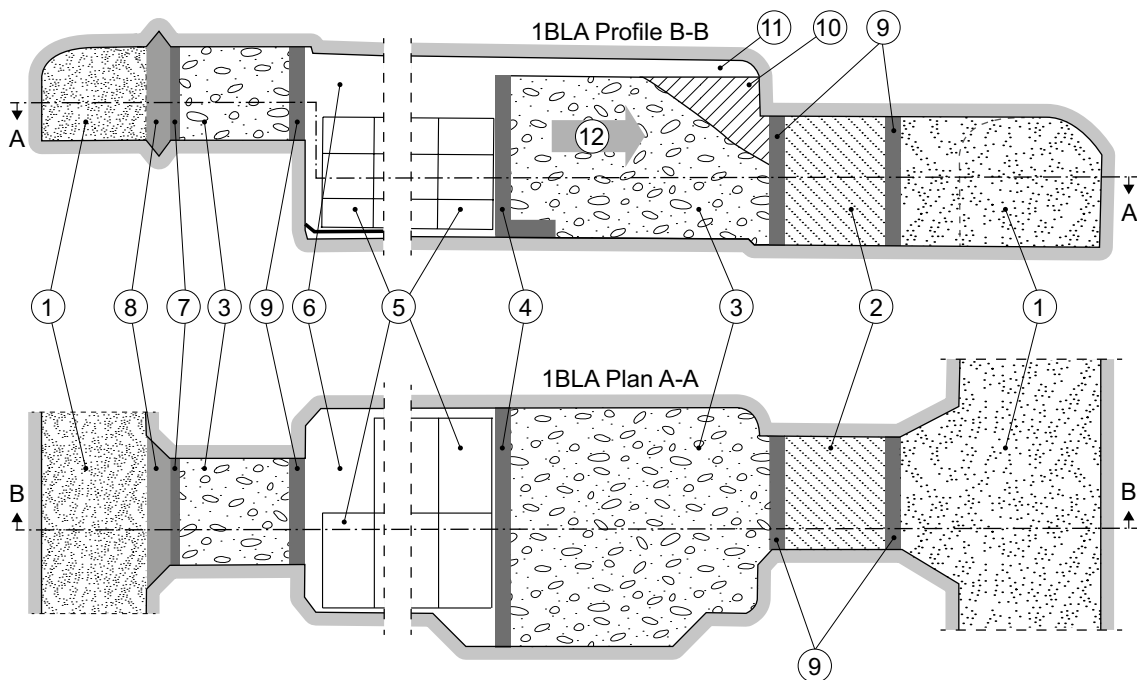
Schematic profile and plan of 1BLA after closure. Key to numbering: 1) Bentonite 2) Transition material e.g. 30/70 mixture bentonite crushed rock 3) Macadam 4) Retaining wall 5) Waste 6) Open waste vault 7) Constraining wall and concrete form 8) Mechanical plug of concrete 9) Constraining wall of concrete for transition material 10) Concrete 11) Gap at roof 12) Working direction for backfilling of waste vault.
